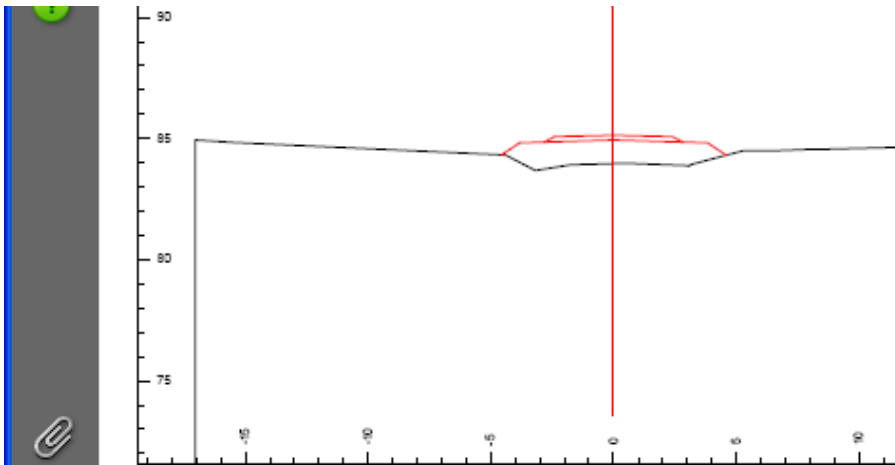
The current, entrenched road surface is shown with the black line. It clearly shows the road surface elevation below the surrounding pastures. Ditch water cannot drain away from the road bed. Raising the road surface brings the road bed above the surroundings and also allows for placement of excess excavation
